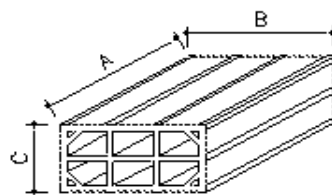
Structure of the Base Case Wall and Layers Details
